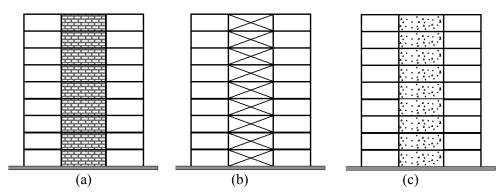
Added different lateral load resisting systems considered in this study. (a), (b) and (c) are masonry infills, steel bracing and reinforced concrete infills, respectively.
